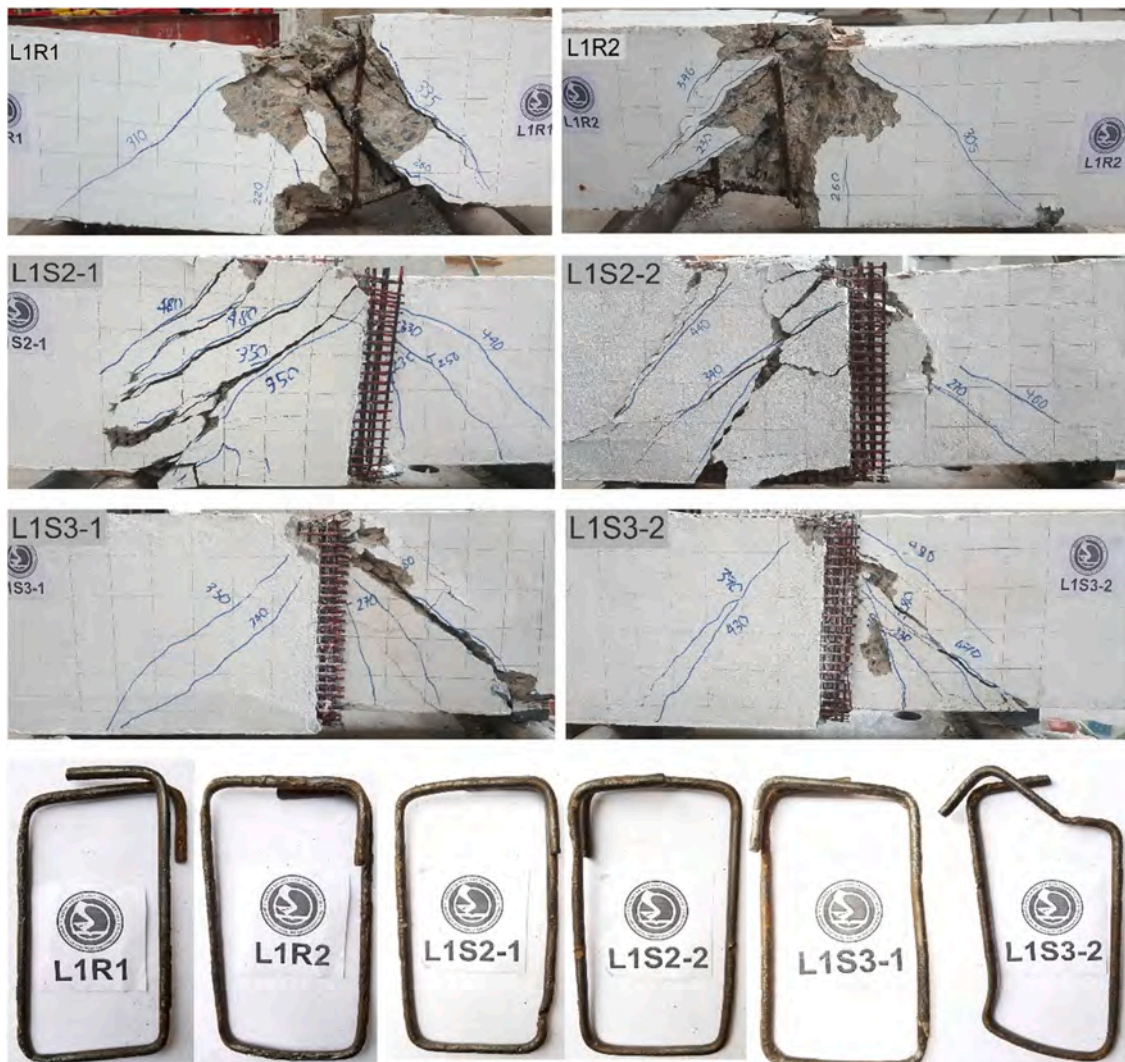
Crack patterns of corroded specimens in Group 2 and the extracted-corroded stirrups.
